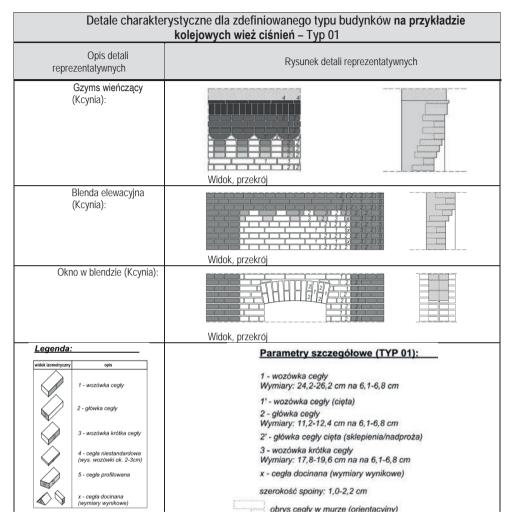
Characteristic details on the example of one of the types of railway water tower buildings [Piotr Brzeziński]
